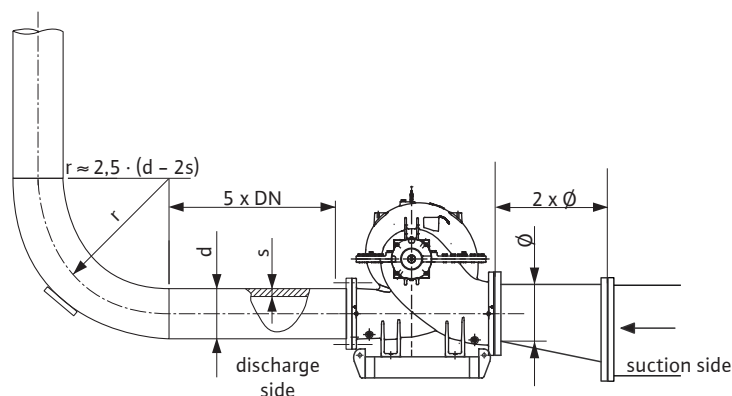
Connecting the pump without tension, settling section upstream and downstream of the pump
